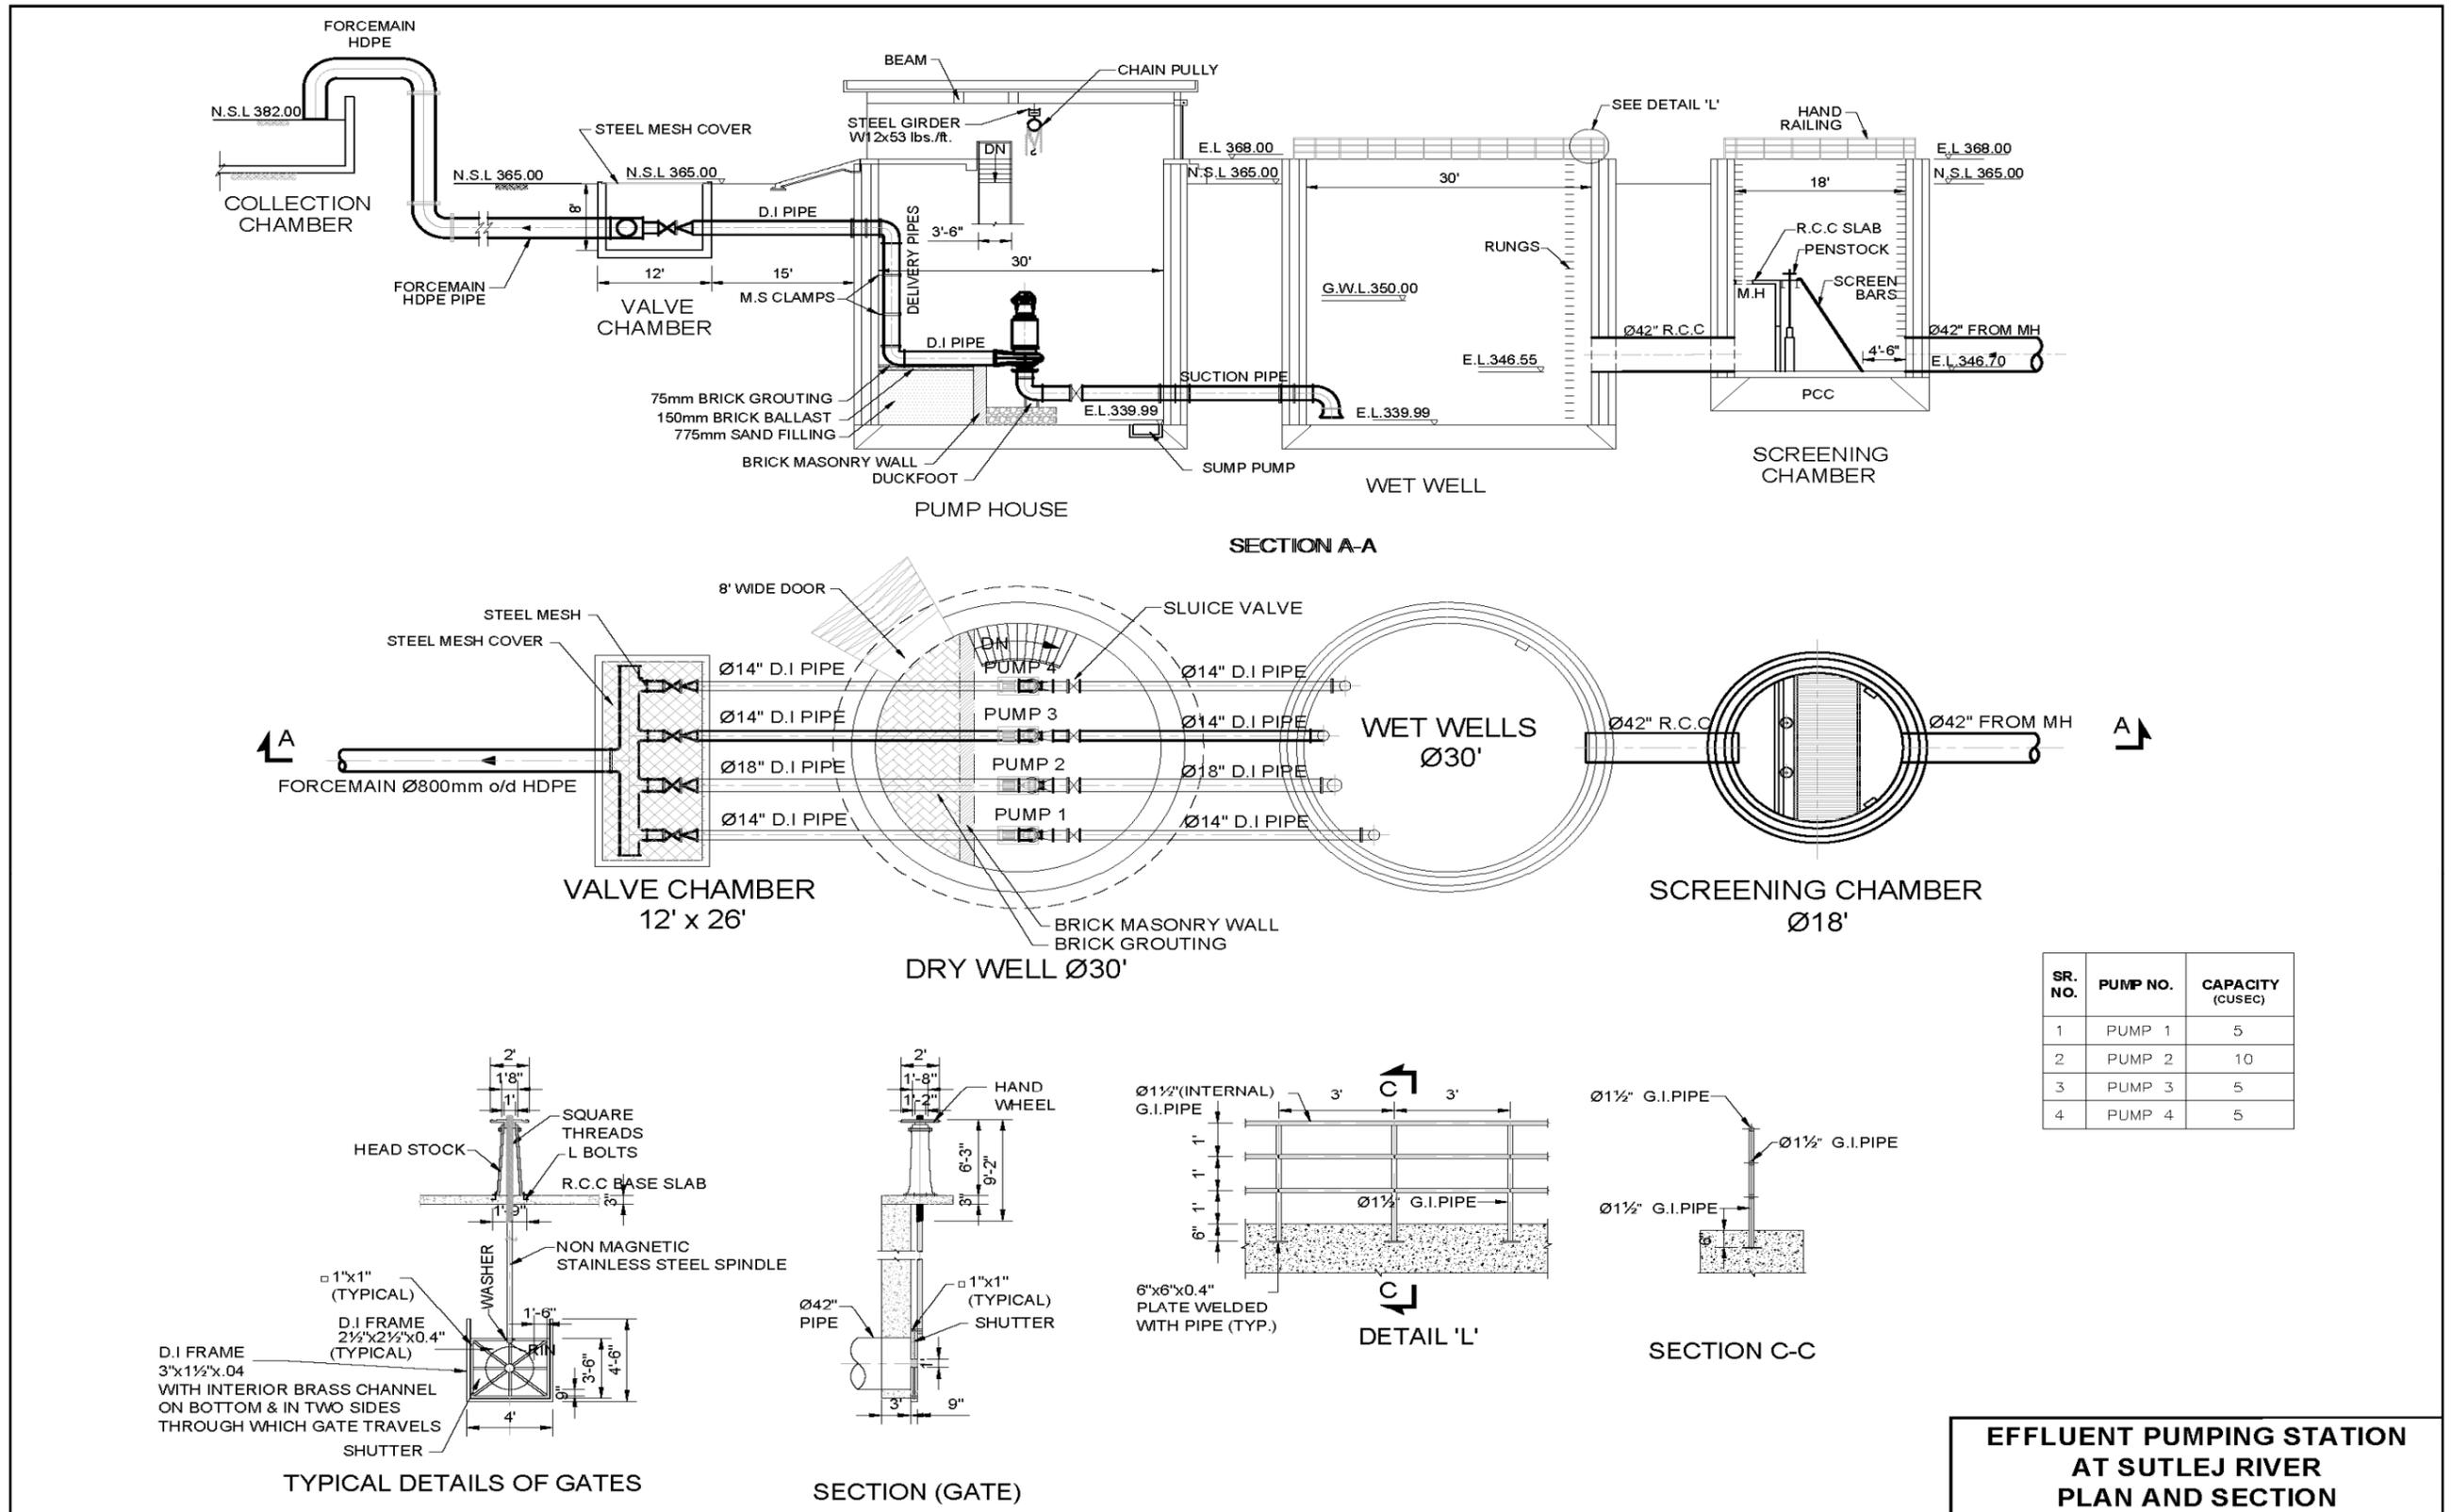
Layout Plan and Cross Section of Final Disposal Station
